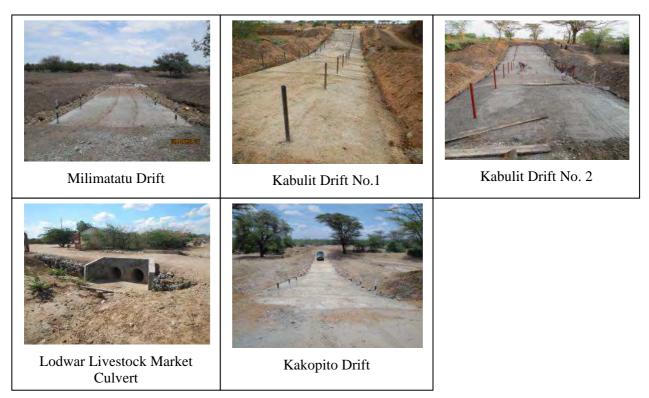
Construction Photos of Rural Road Improvement(under construction)
